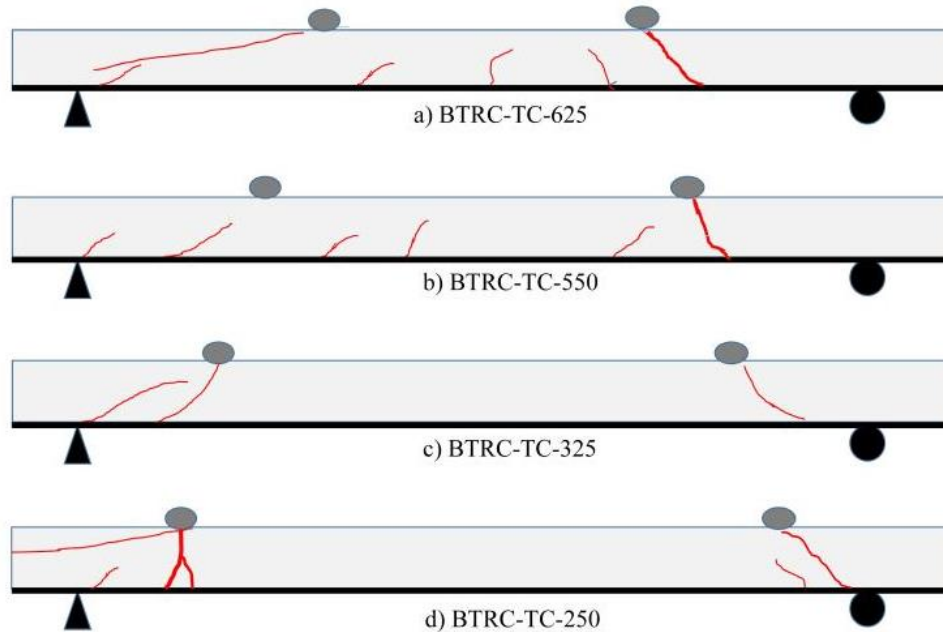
Crack patterns in BTRC-TC composite slab specimens.
